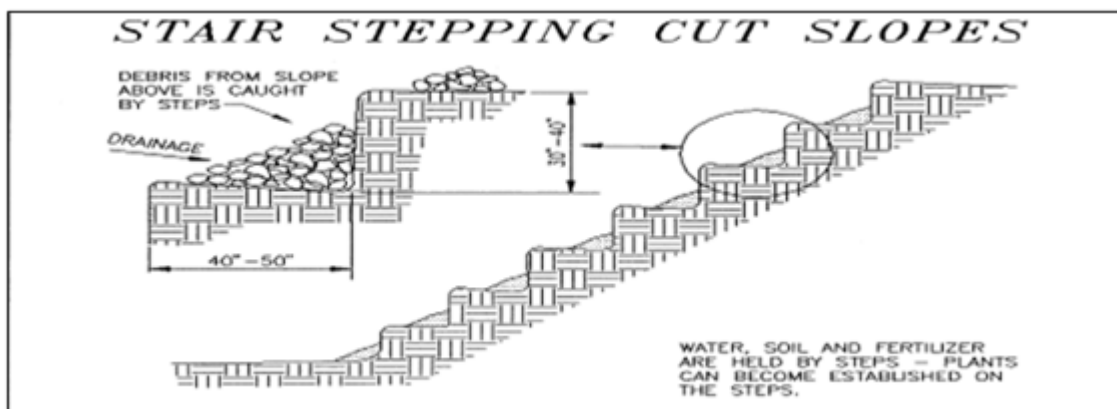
Illustration of Stair Stepping Slope Treatment Method
